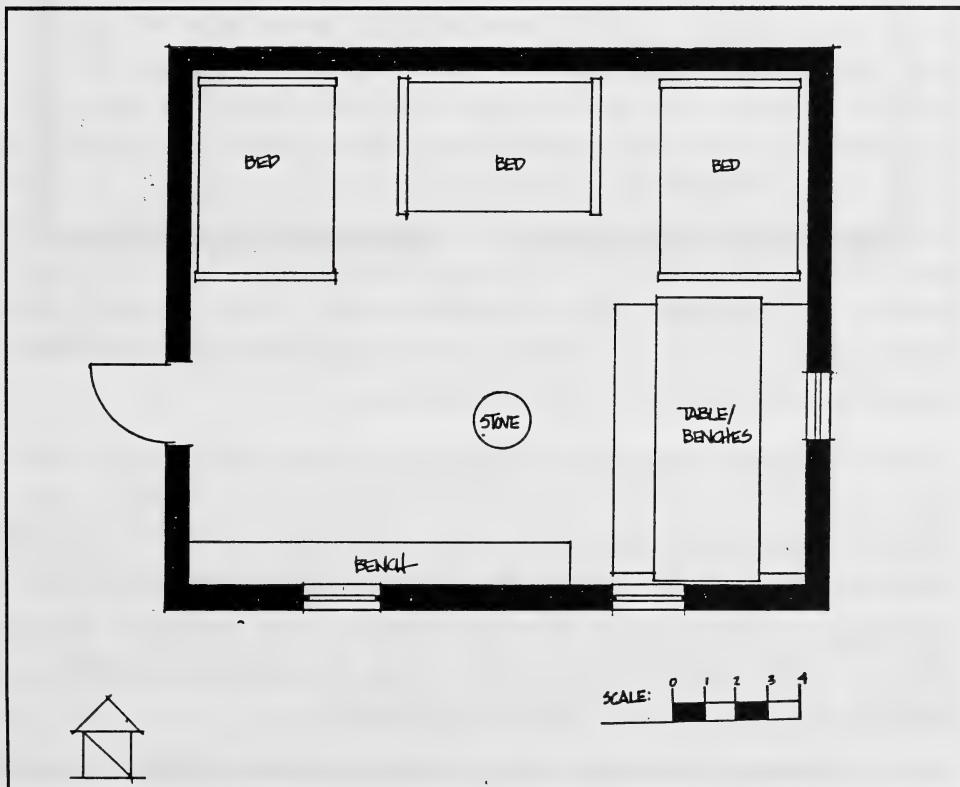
Plan of Mike Hawreliak's first house, ca. 1917.
